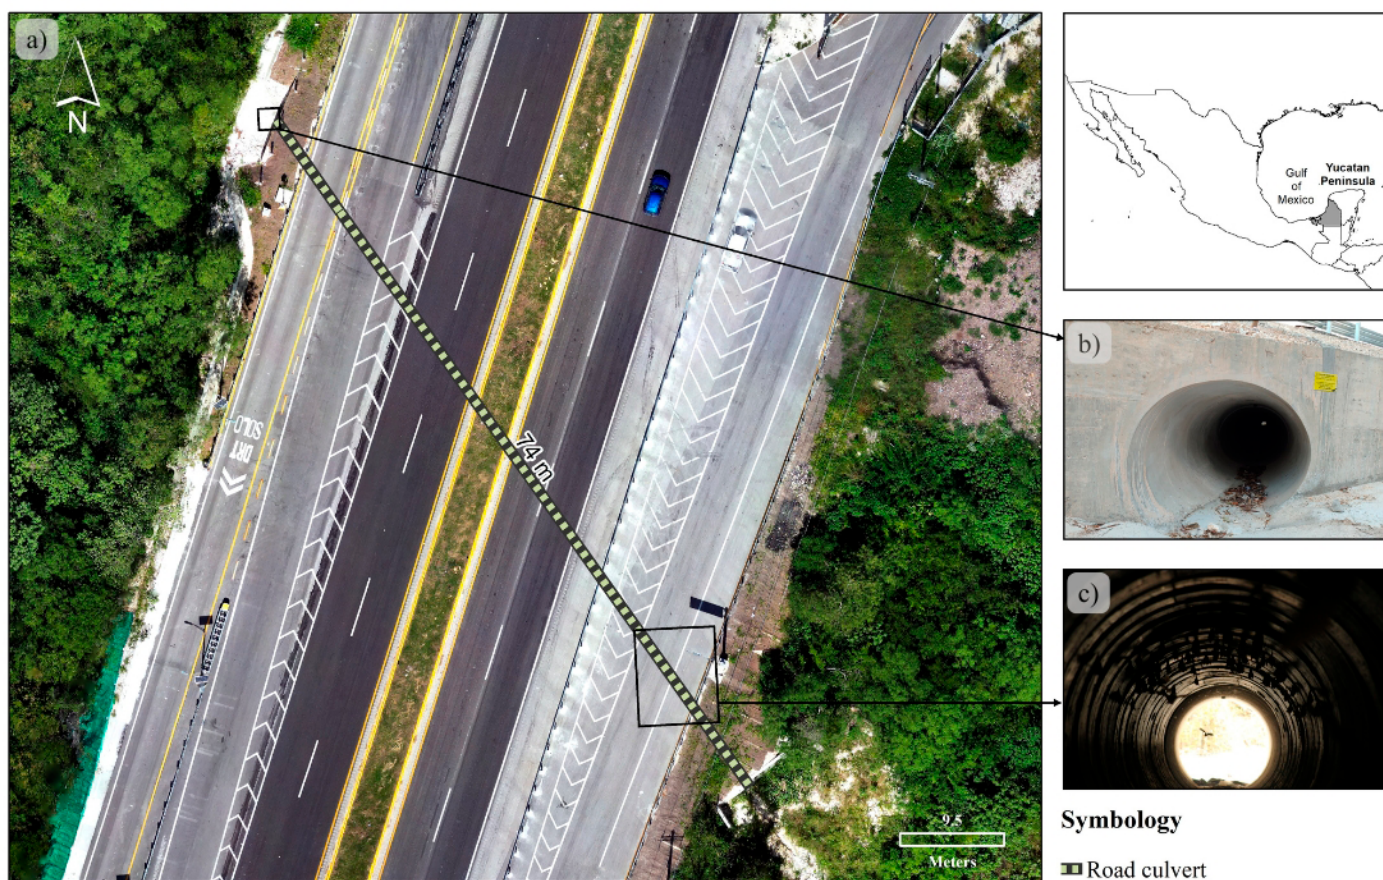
Study area in southeastern Mexico showing the road culvert inhabited by *Mimon cozumelae* during road construction. (a) Location and total length (74 m) of the reinforced concrete pipe culvert within the highway infrastructure. (b) West entrance of the culvert used by the colony as a diurnal roost. (c) Interior view of the culvert showing the spatial distribution of bats within the structure.
